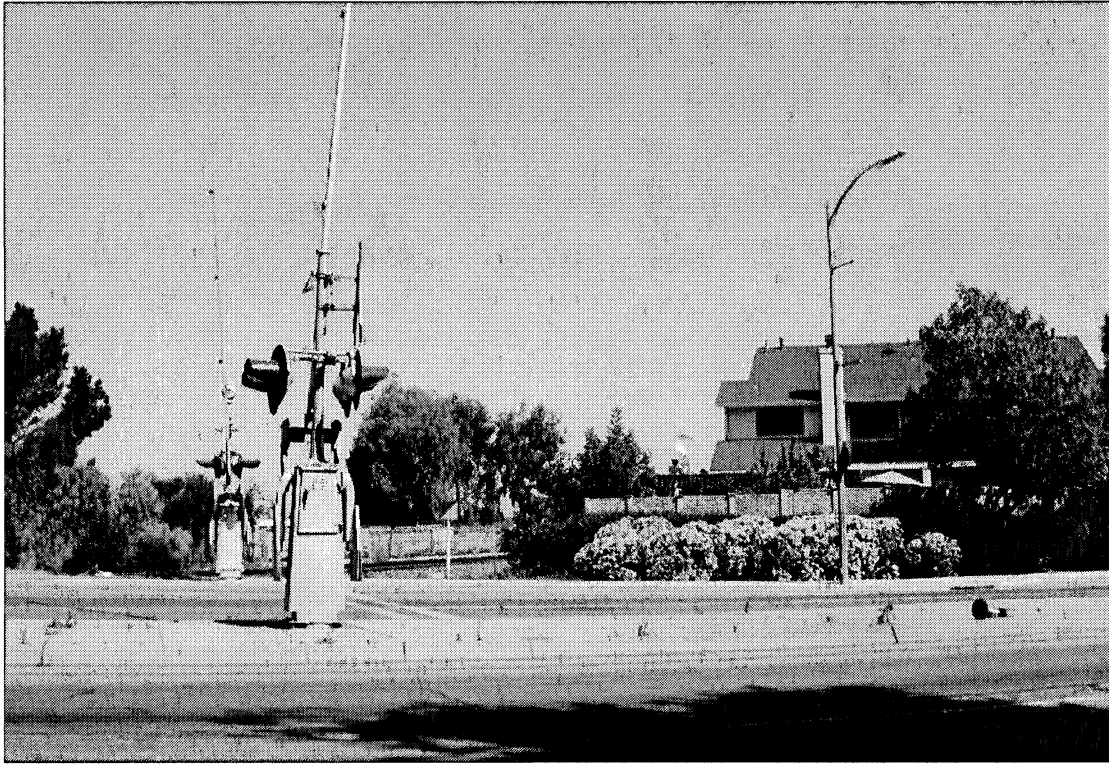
View of railroad tracks adjacent to Site 2, looking north across Berryessa Road.
